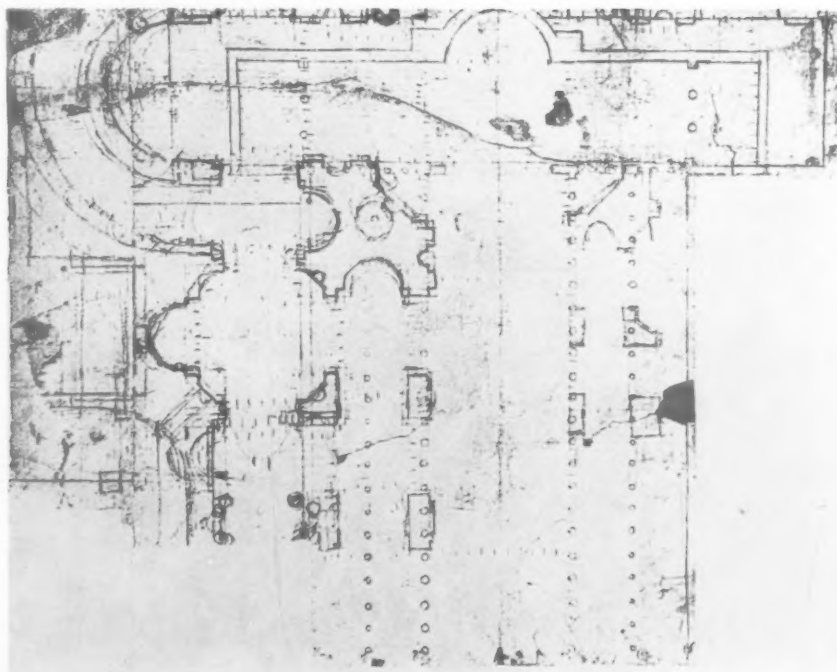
Bramante(?), Plan of St. Peter's, detail. Florence, Uffizi (dis. arch. 20)
